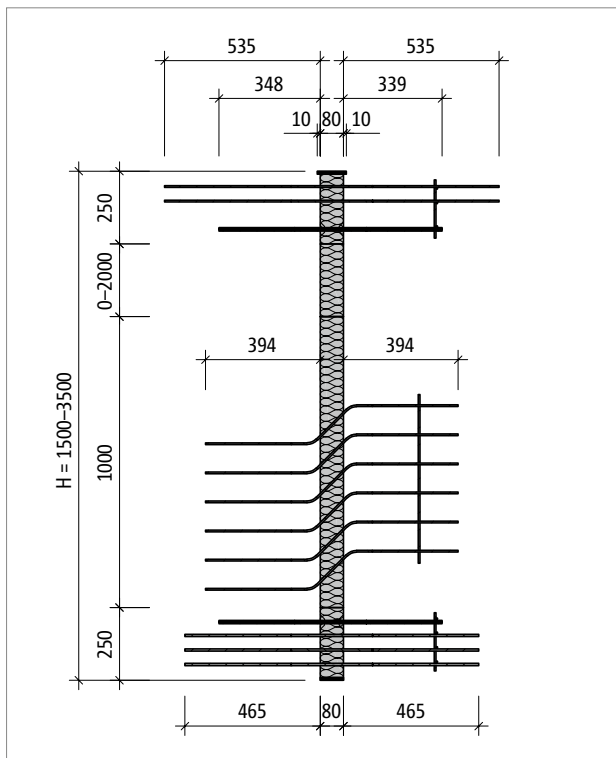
Schöck Isokorb® T type W-M1-R90: Product layout; Fire protection board top and bottom
